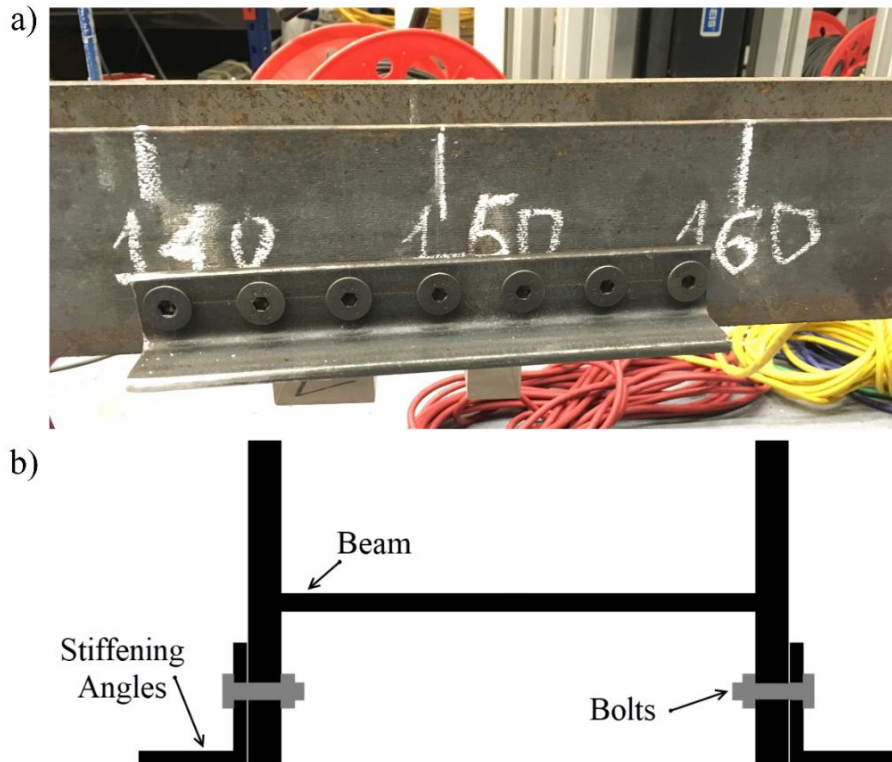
Beam stiffening detail (a) Elevation view of the stiffening angles. (b) Cross section of beam and stiffeners.
